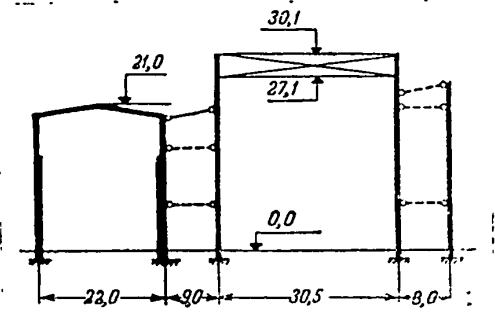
Scheme 2. The steel rigid frames of the boiler house, of the turbine hall and the outside wall of the bunker section are interconnected by hinged steel members.
